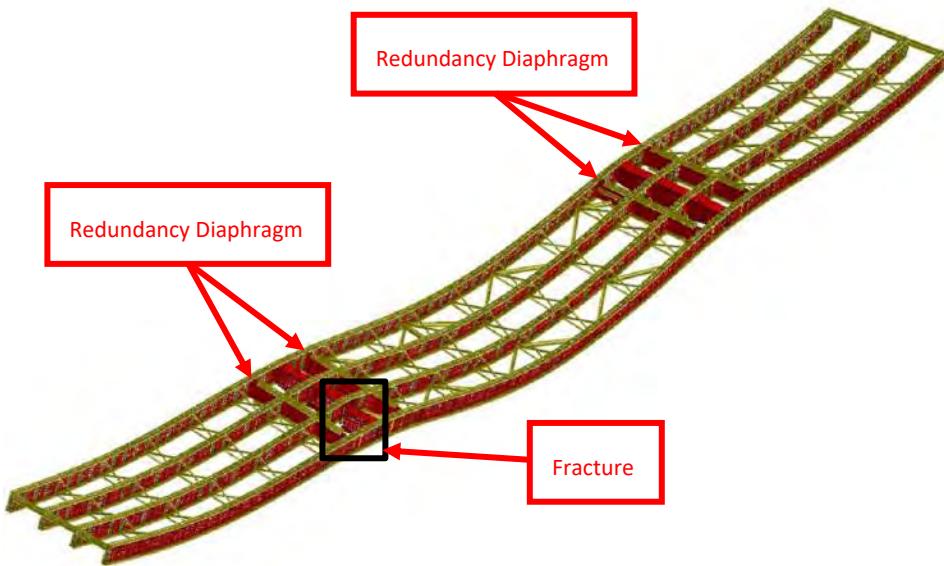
Deformed shape of repaired structure at 1.5xHL-93 loading (Deck not shown for clarity)
